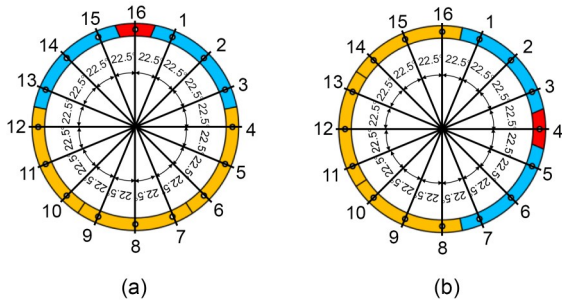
Assembly point diagram of a 16-point segment: (a) assembly point 16; (b) assembly point 4
